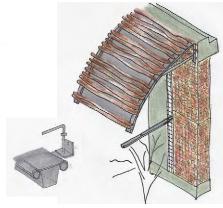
Shading structure and Feeding Tray.1 – Stabilization; 2 – Wall brackets; 3 – Rod supports. (See section 7, drawing B6)
